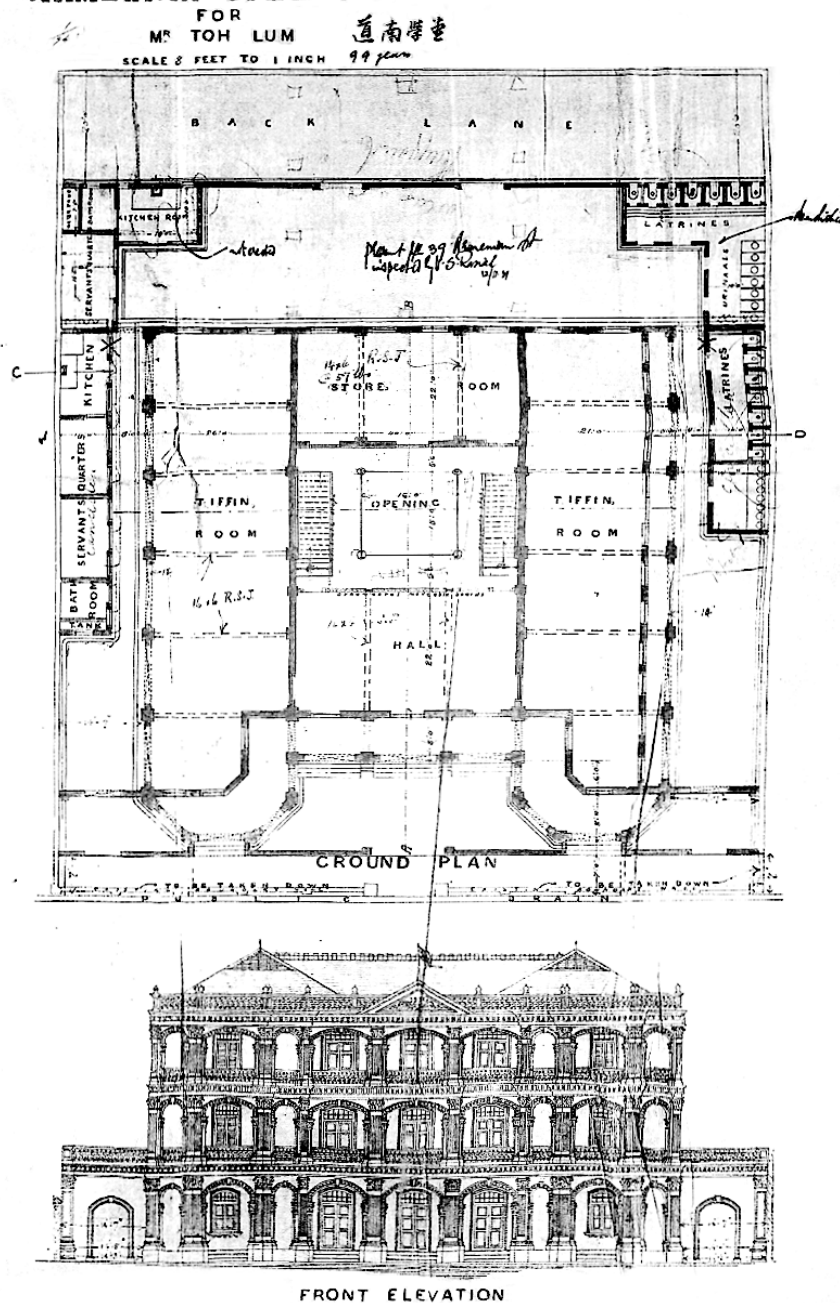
Chong & Co. Plan and elevation for the Tao Nan Chinese School at Armenian Street, 1910.
